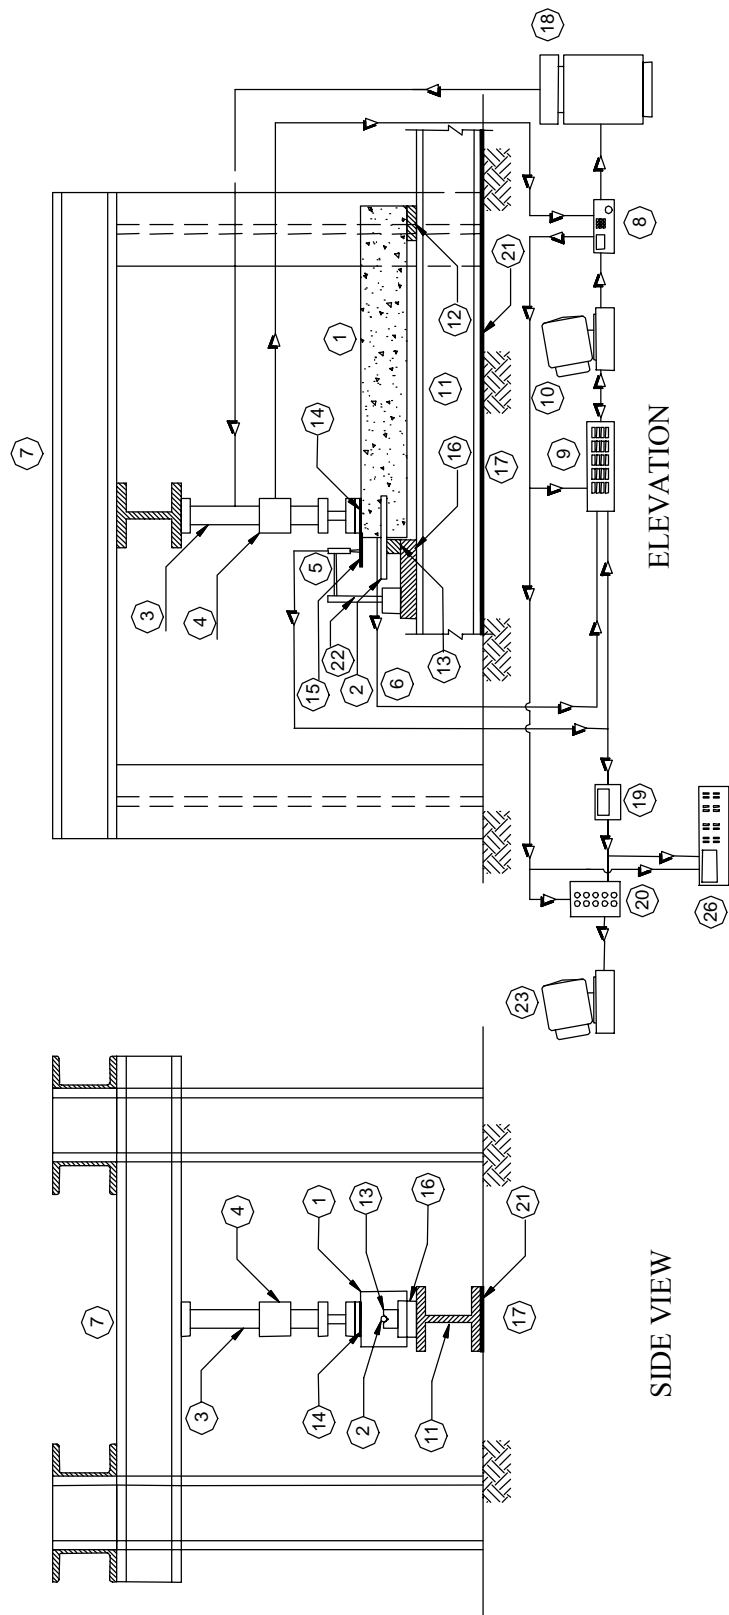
Schematic drawing for test rig mounted with half joint specimen
